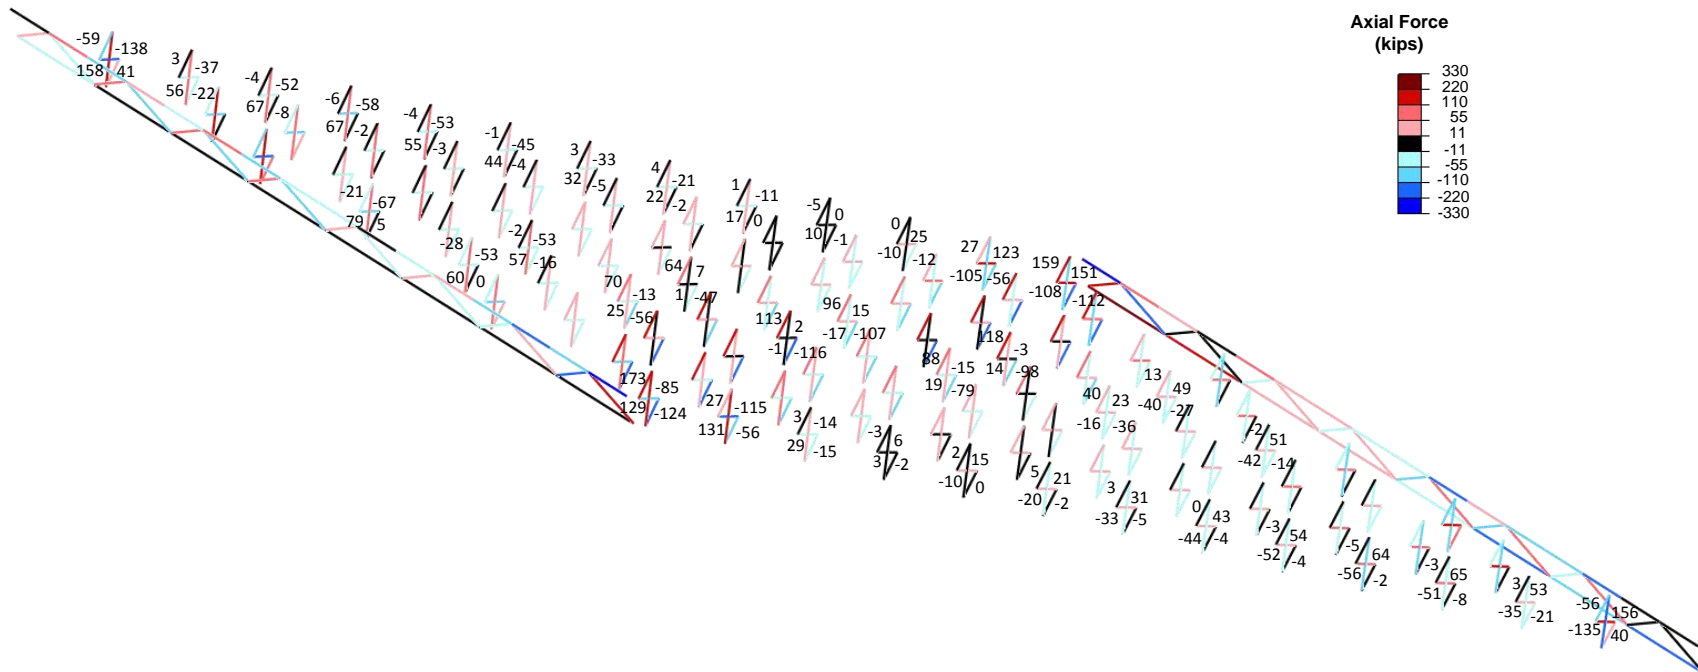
NISS54, Cross-frame forces under lack-of-fit due to TDLF detailing.
